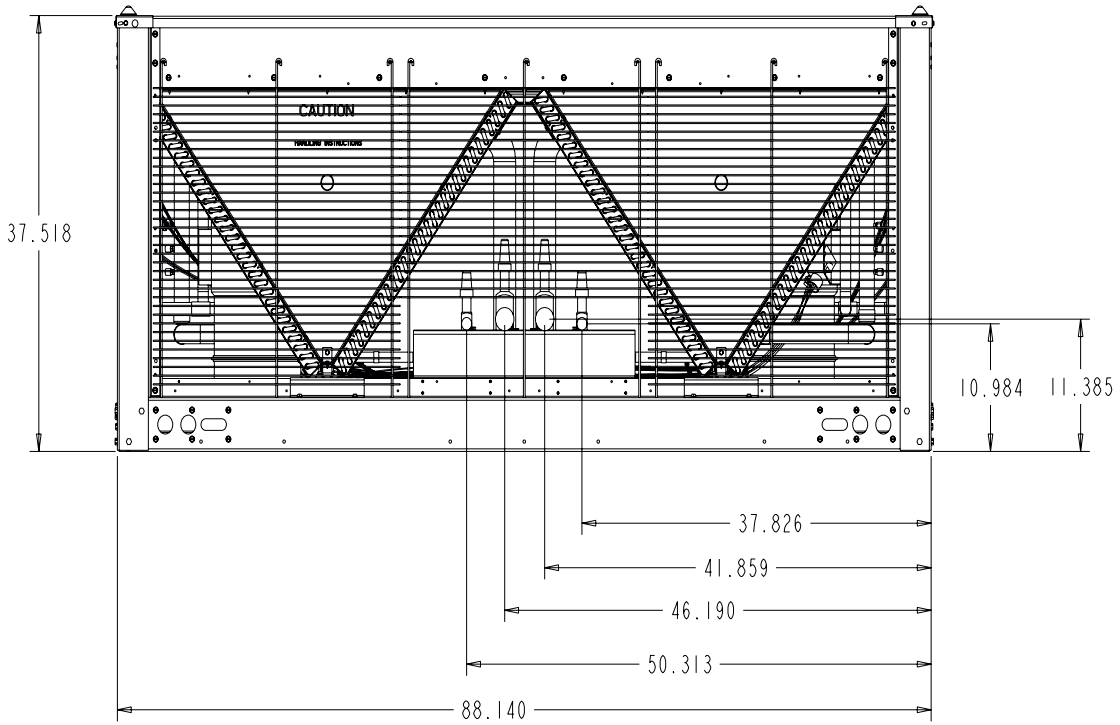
30 & 40 TON PIPING CONNECTIONS
